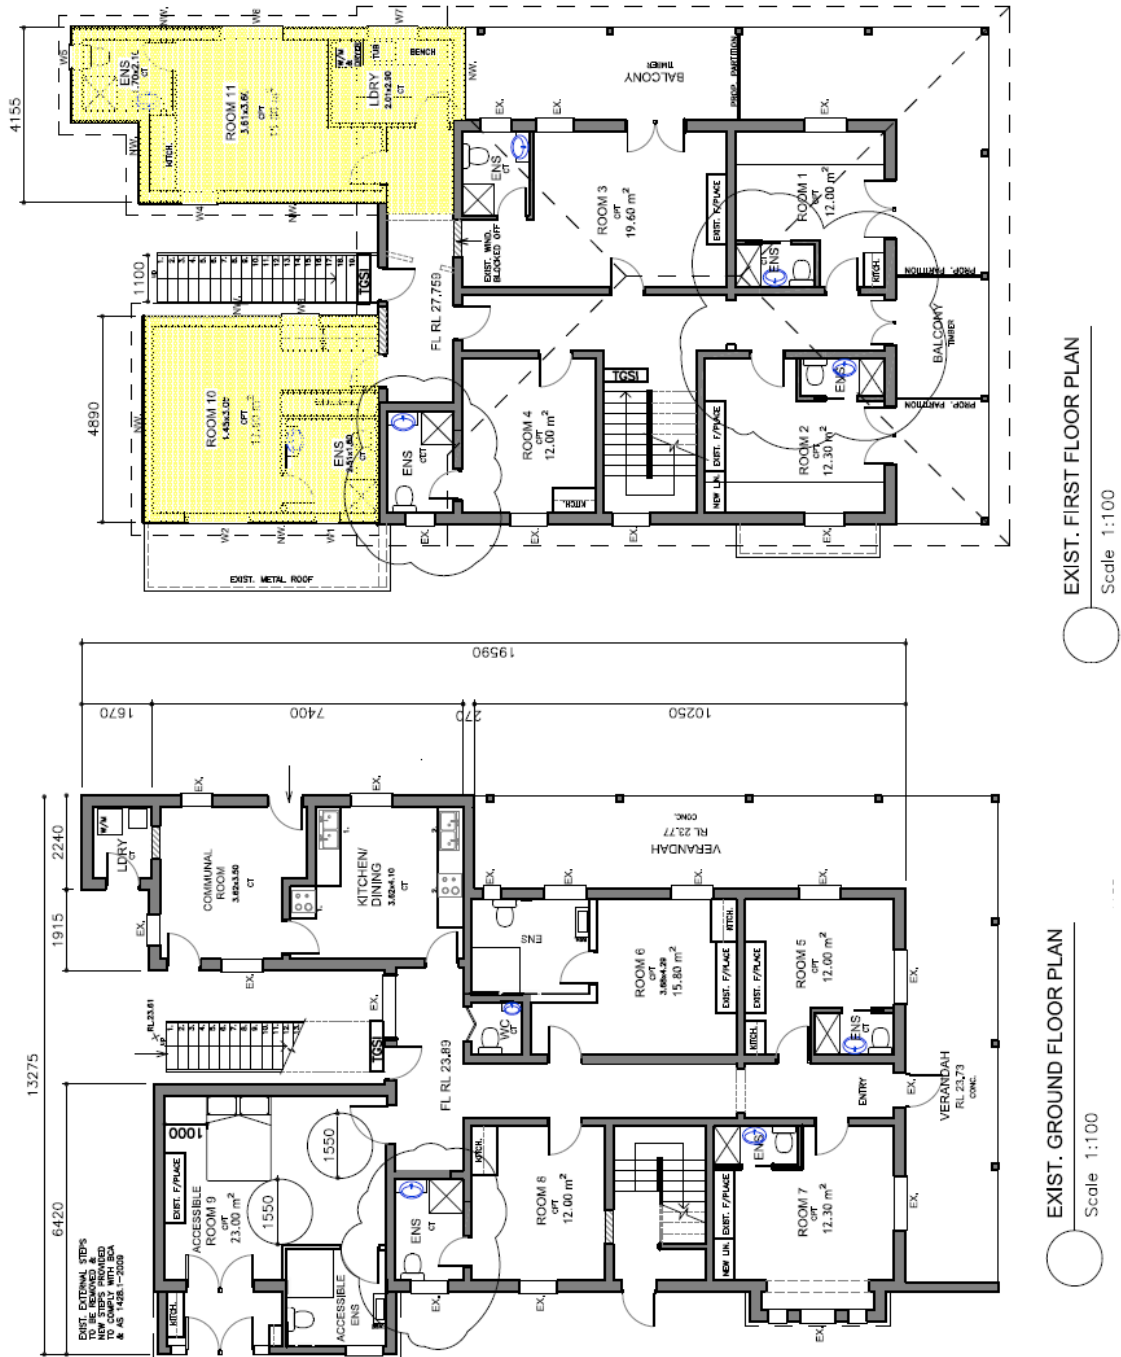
Amended plans submitted by applicant showing the existing layout of premises
